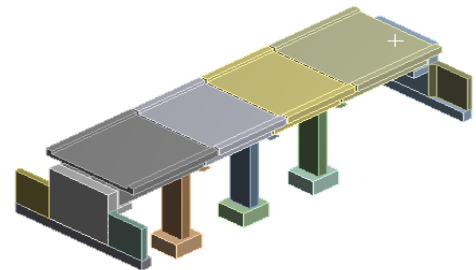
(a): Reinforced concrete girder bridge with cantilever inline wing wall
